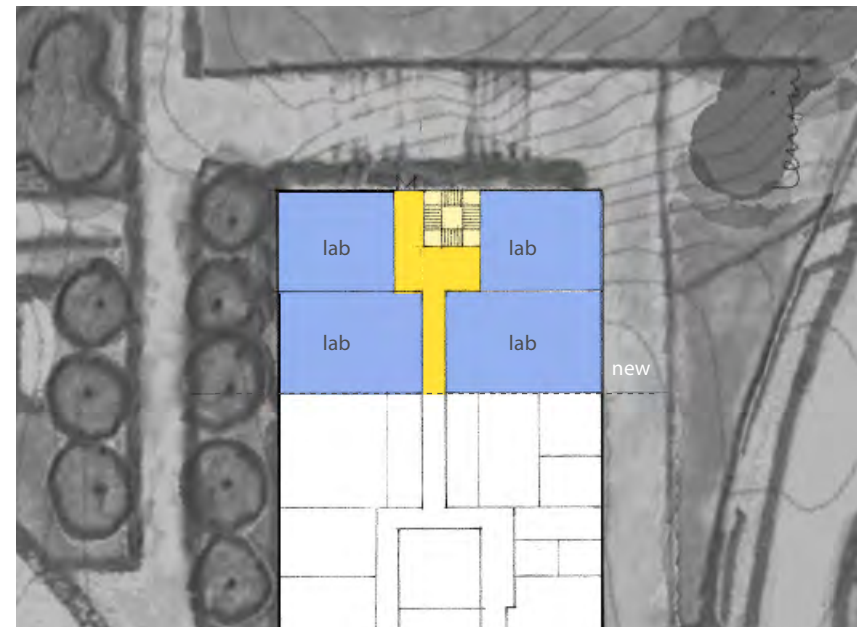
LENOIR HALL - PROPOSED SECOND LEVEL
